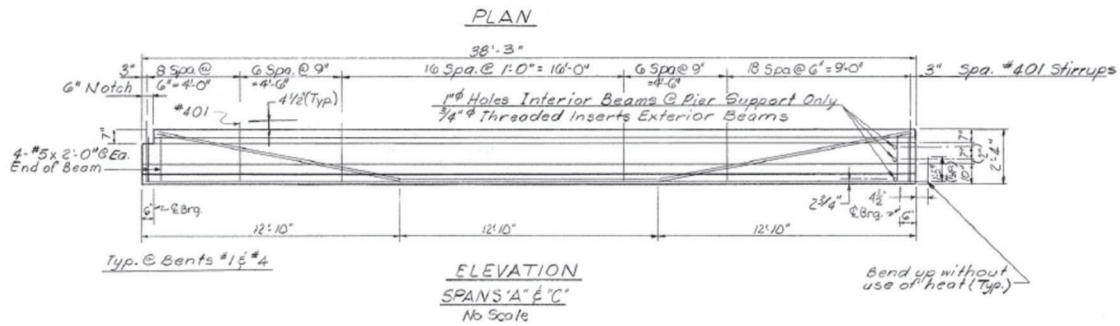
Elevation of test specimens (INDOT, 1987).
